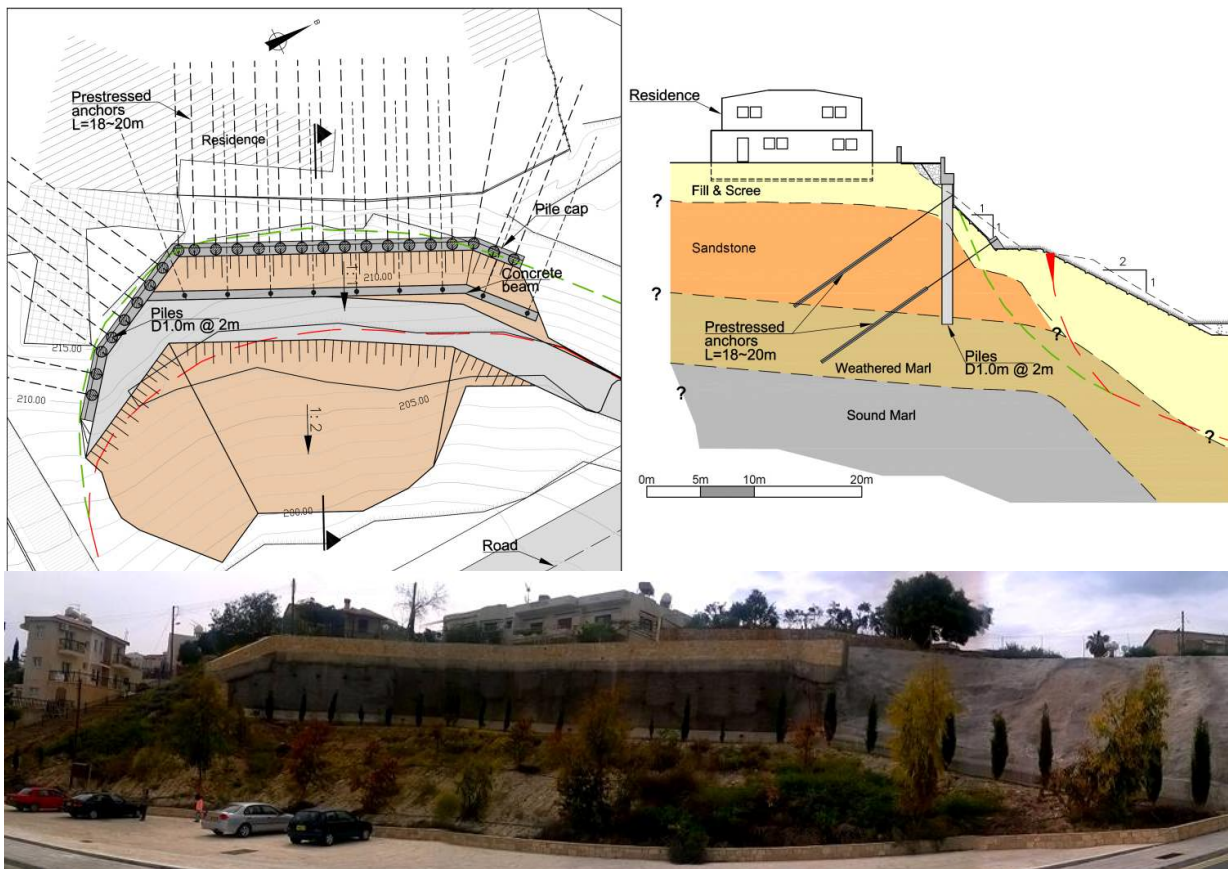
The landslide back scarp area after its stabilization by installing a permanent anchored wall.
